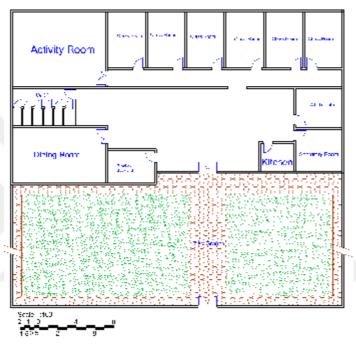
Floor plan of Misrata C Kindergarten (Drawn by author)
